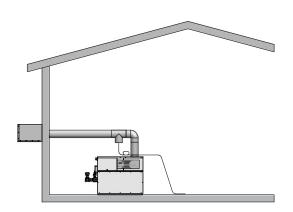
Sidewall Vent - Models 402 - 752 (Only)
